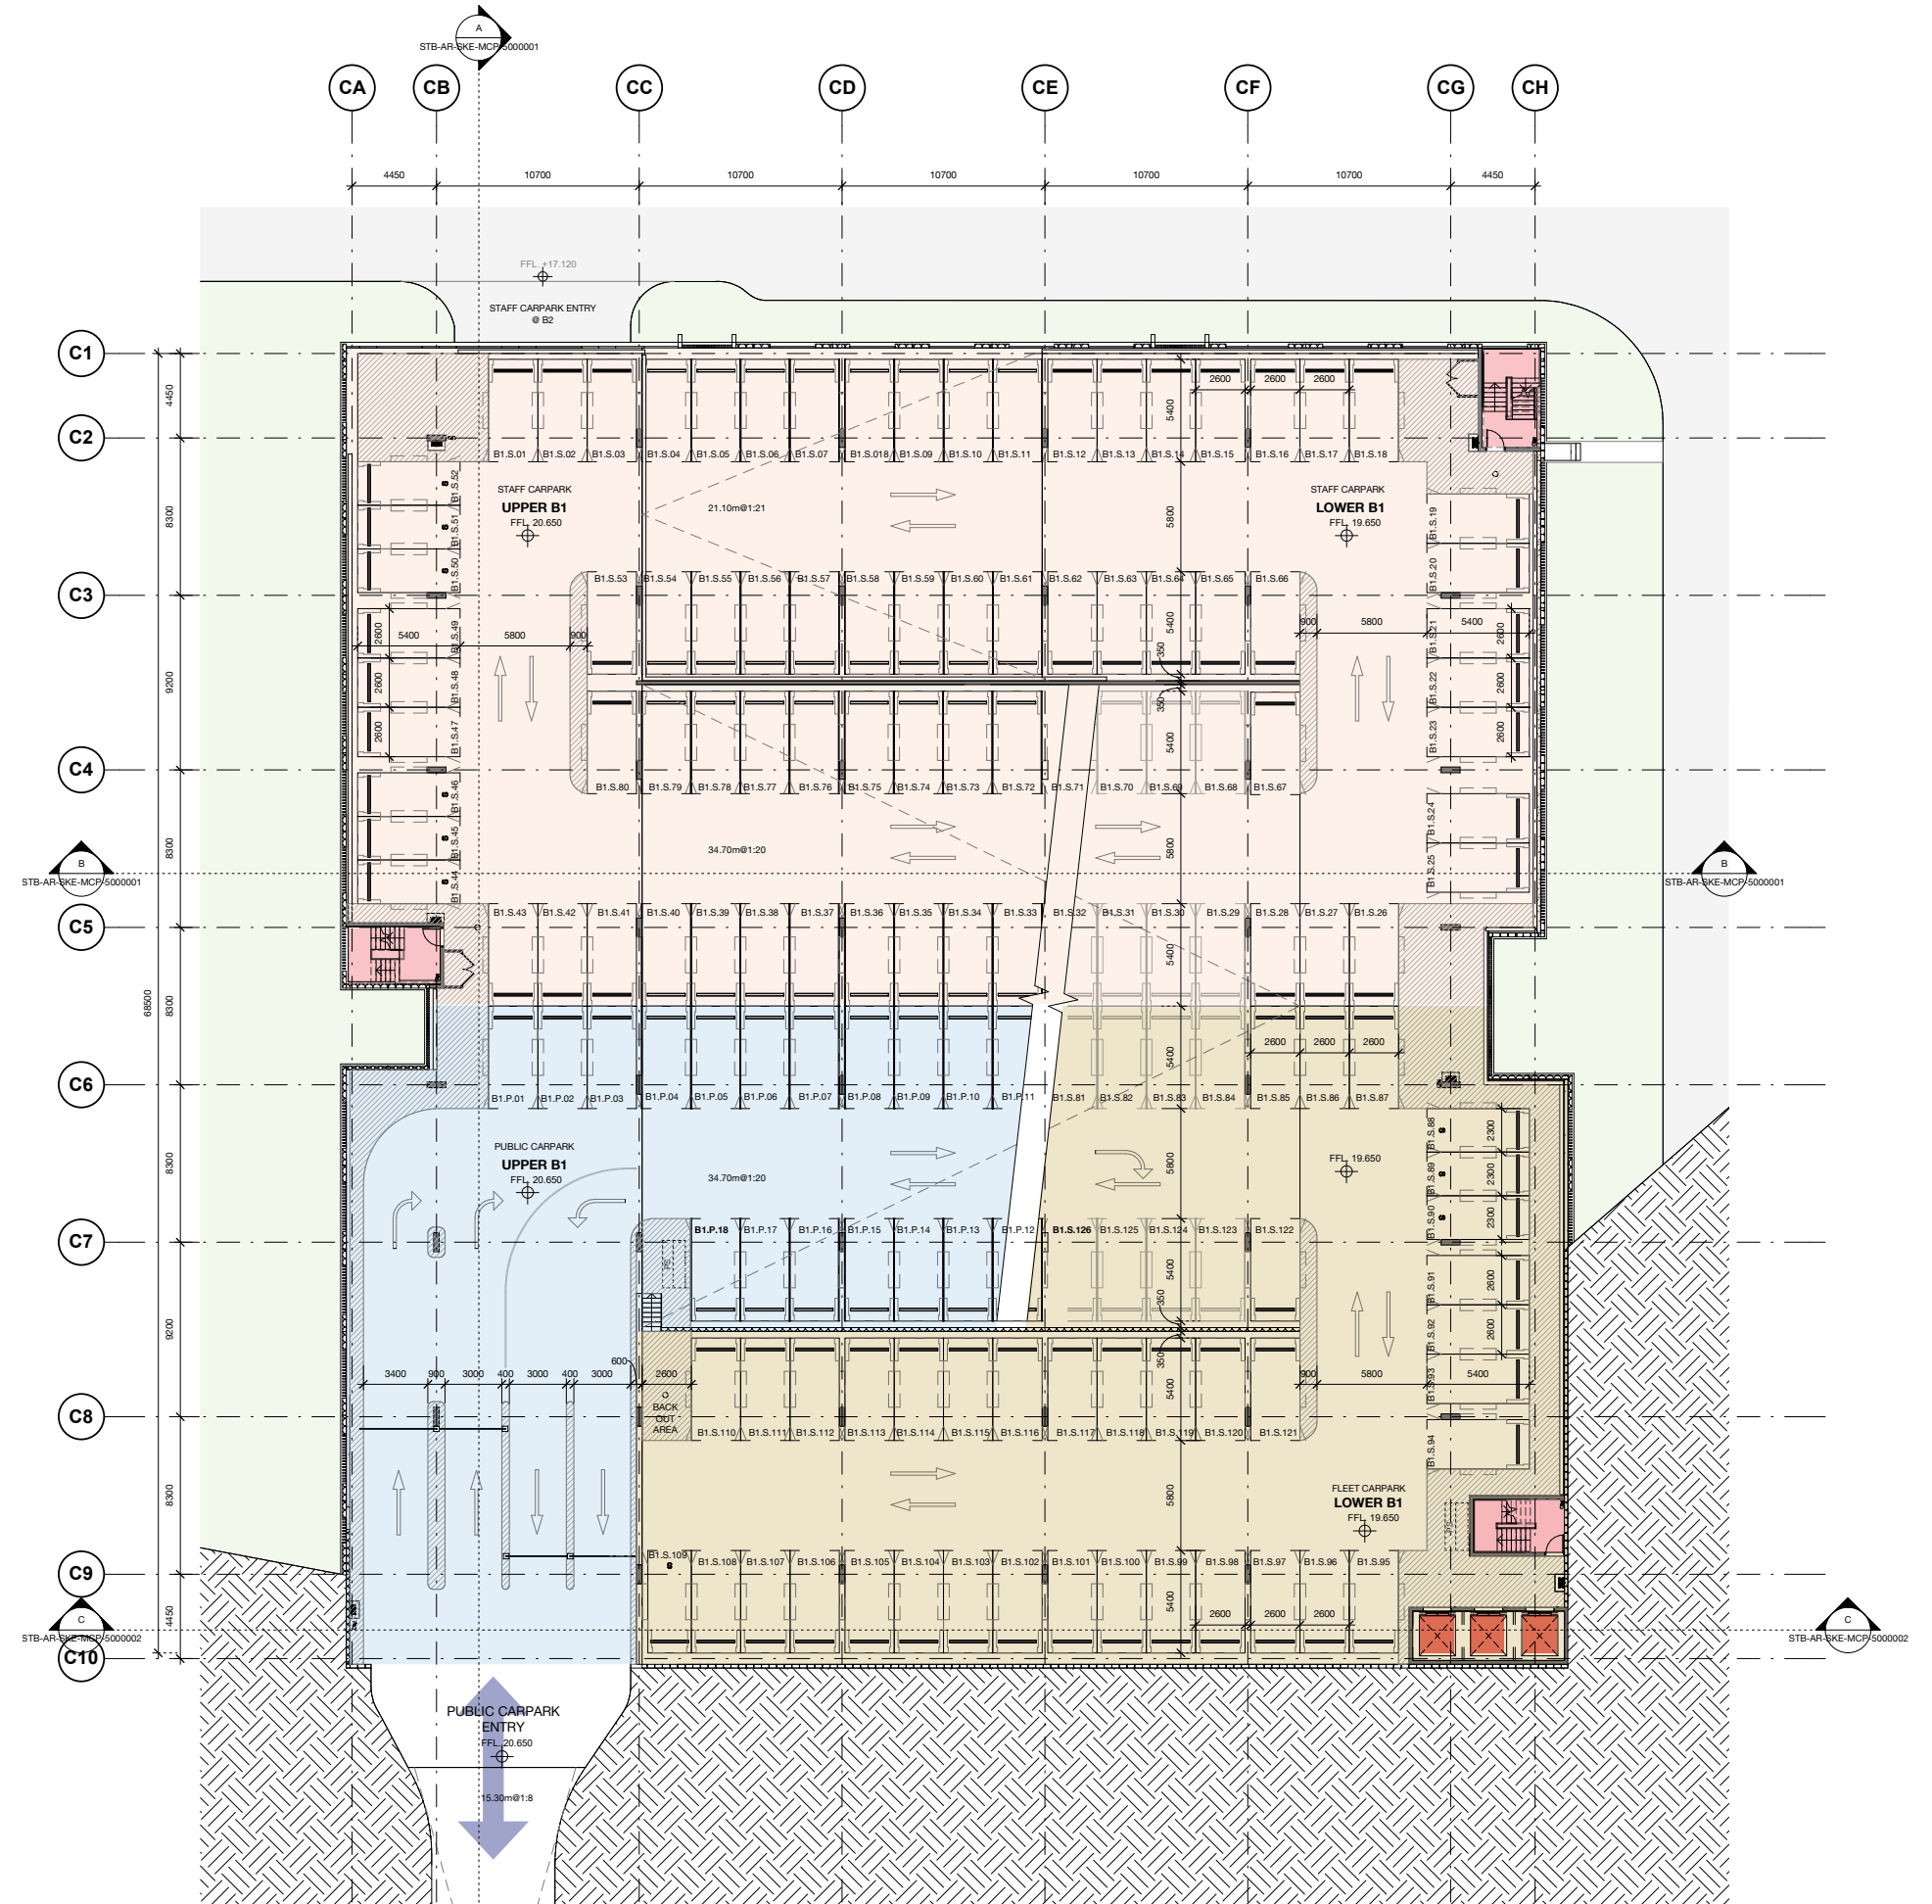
Multi-Deck Carpark, Floor Plan - Basement 2
